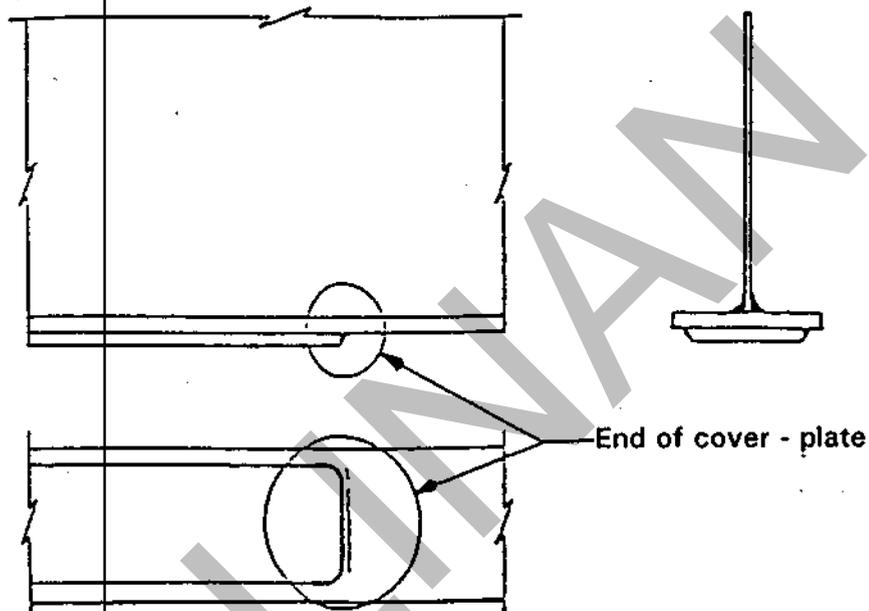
Cover-Plated Beam Showing Common Location of Cracking
